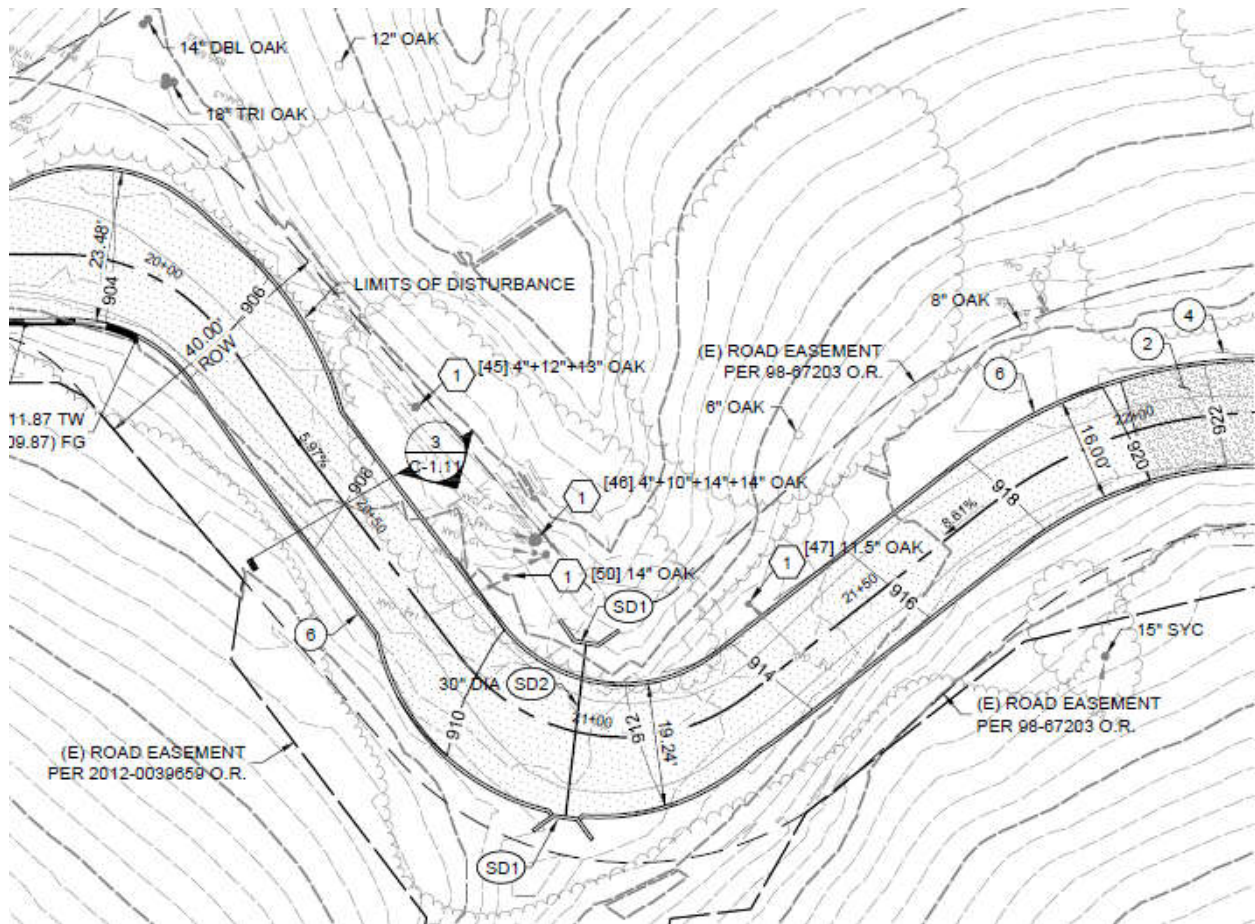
Section C-16. Oak trees #42 and 43 are shown on the previous plan section.
